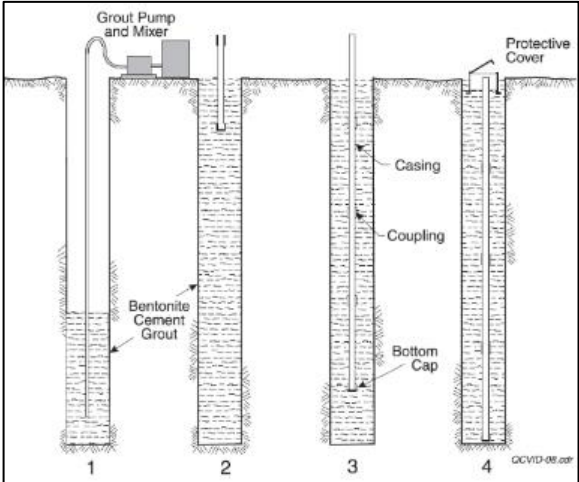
Recommended grout mix for the inclinometer boreholes and installation process (RST 1997)
